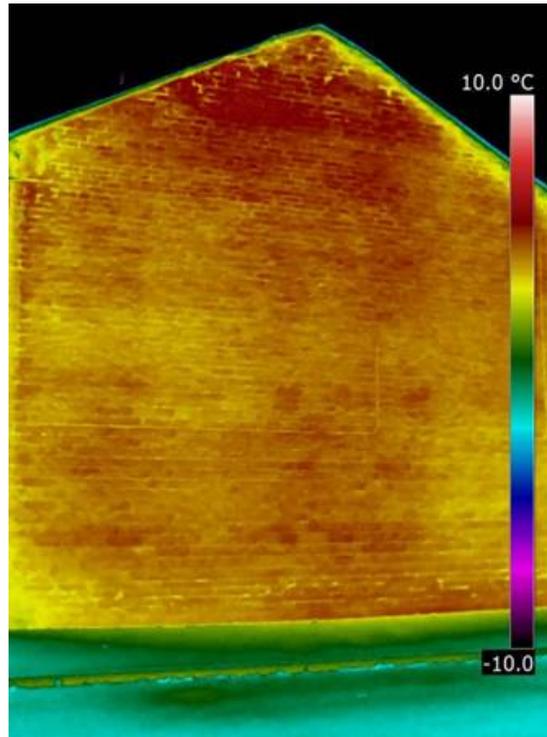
Solid stone wall dwelling with room in roof (insulation at eaves level). Higher temperatures apparent in room in roof.
